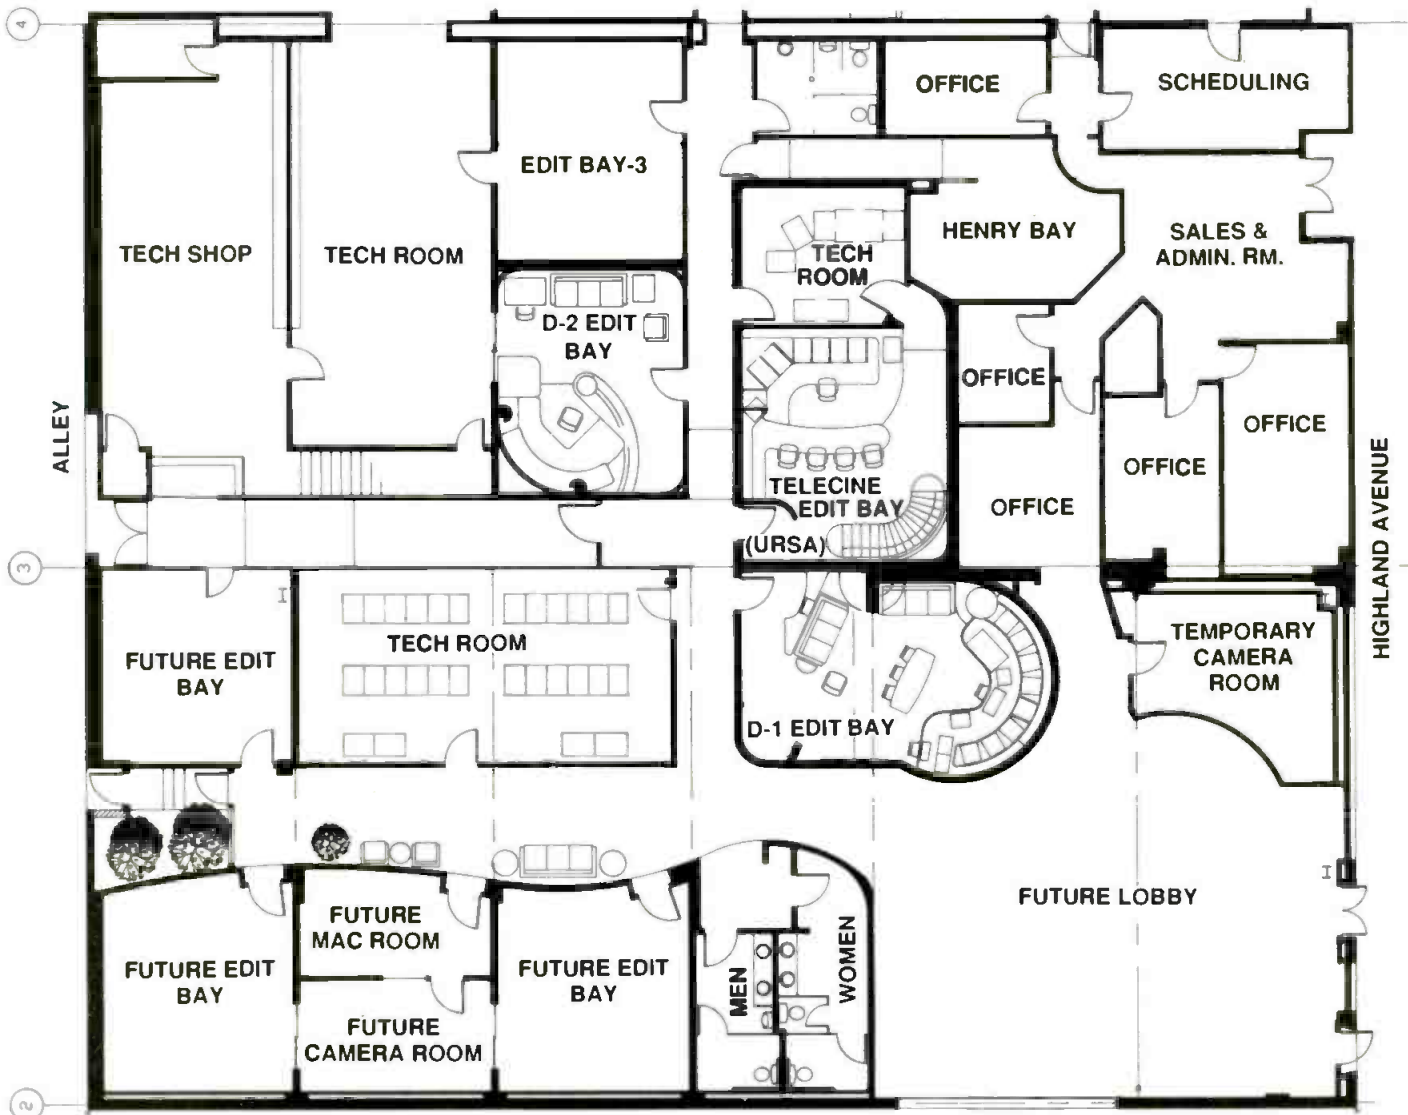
Floor plan for Editel LA. Drawing courtesy of Gary Heathcote, AIA.
